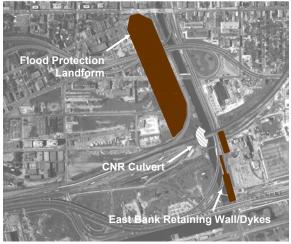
Flood Protection Landform with Culvert & East Bank Works
